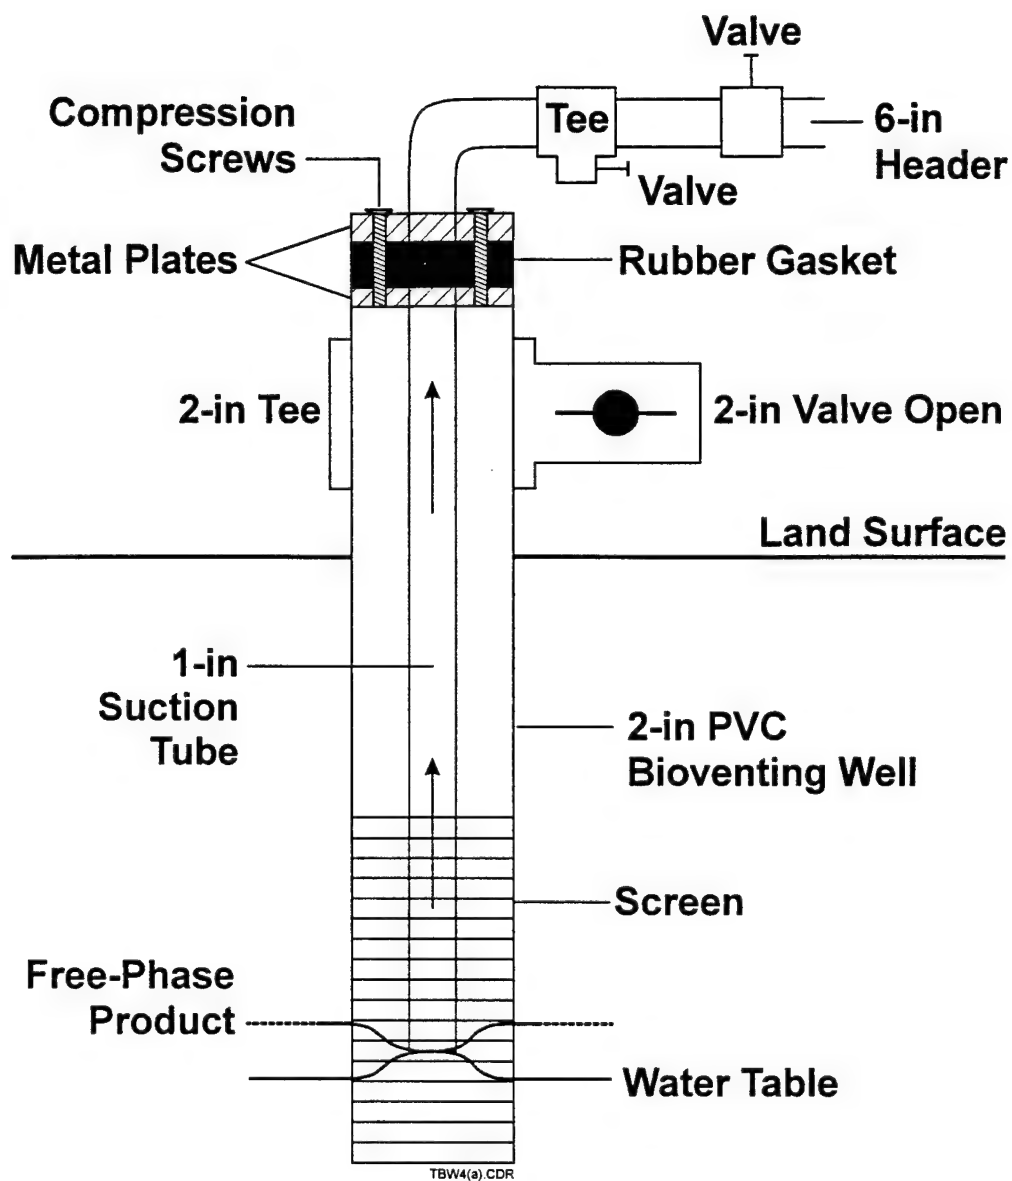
Slurper Tube Placement and Valve Position for the Skimmer Pump Test
